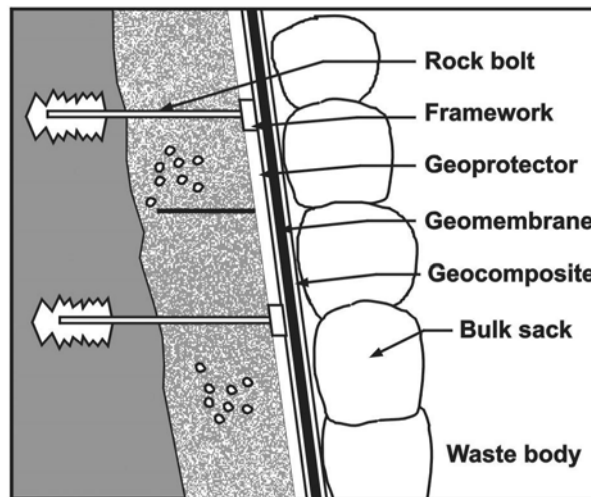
Cross-section through a frame supported geomembrane system (after Gallagher *et al.* 2000)
